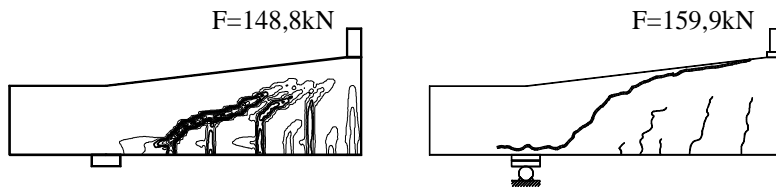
Crack propagation at failure of test beam 3K2 from Non-FEM and test
